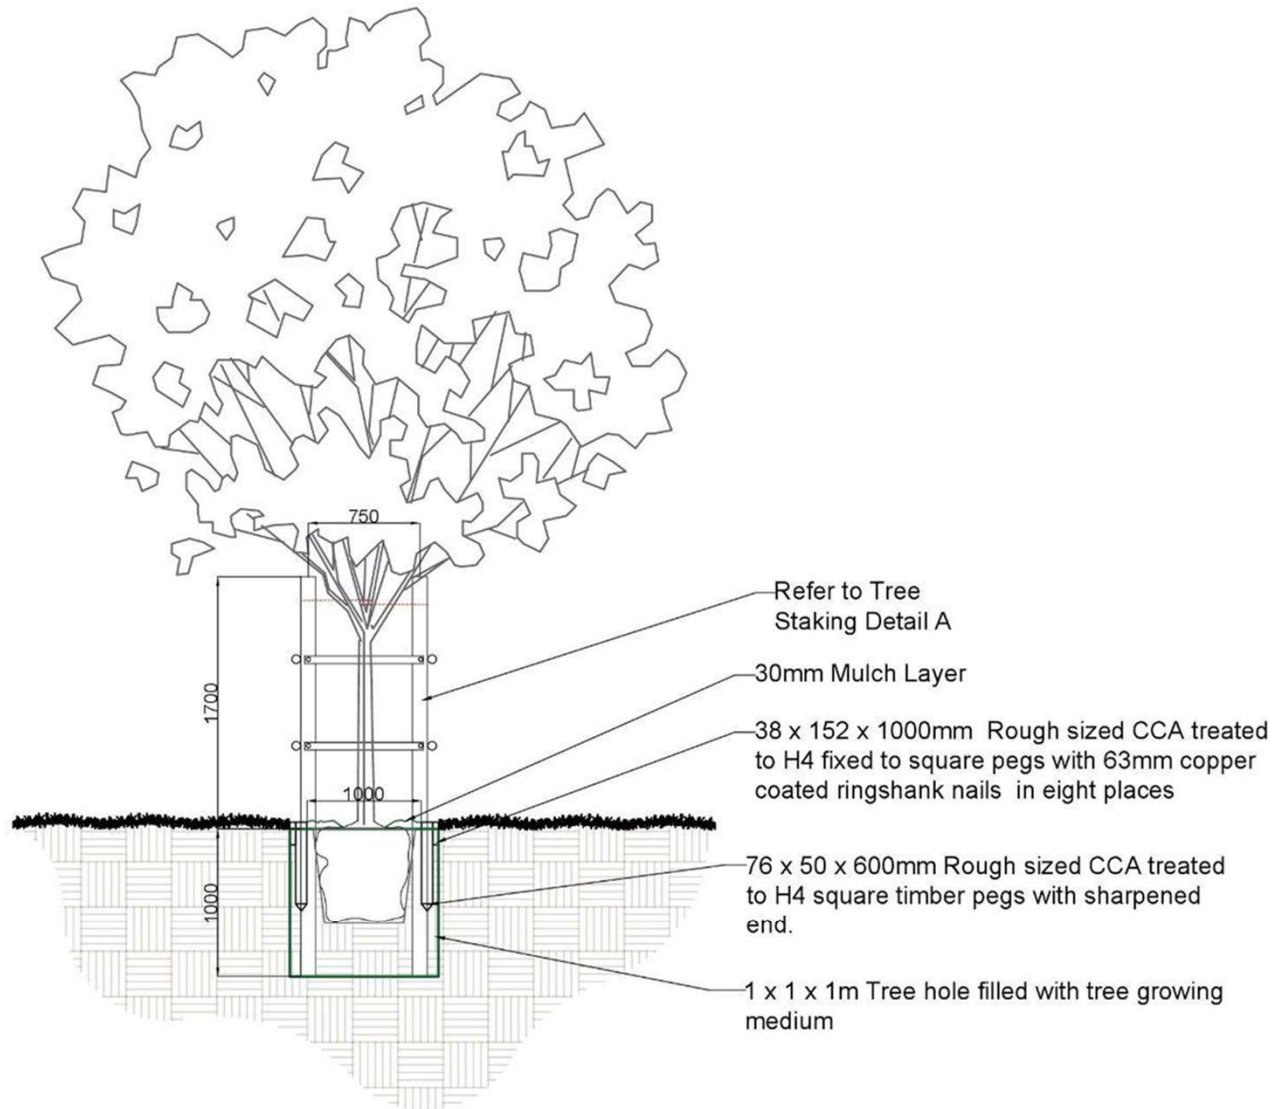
Softscape Tree Detail Section (Viridian Consulting, 2024)
